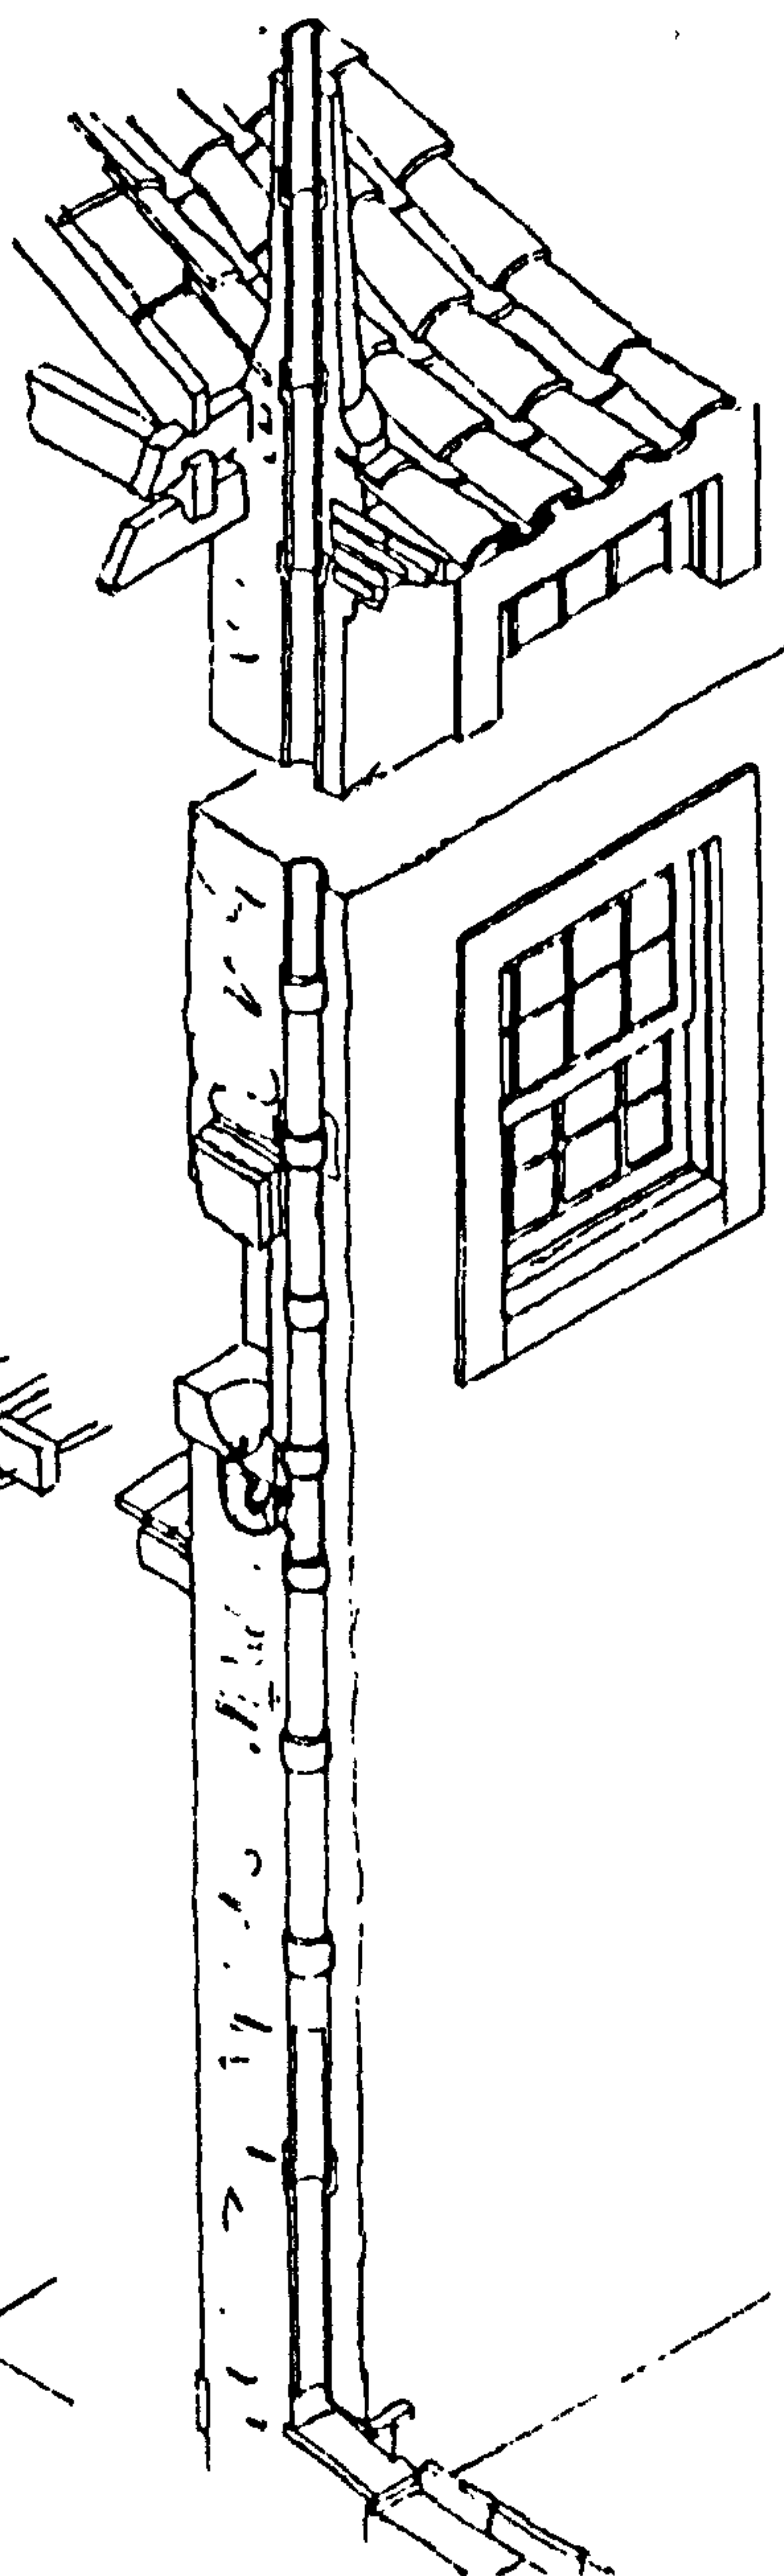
Construction detail of the drainage system of the building, outside view (building M)
